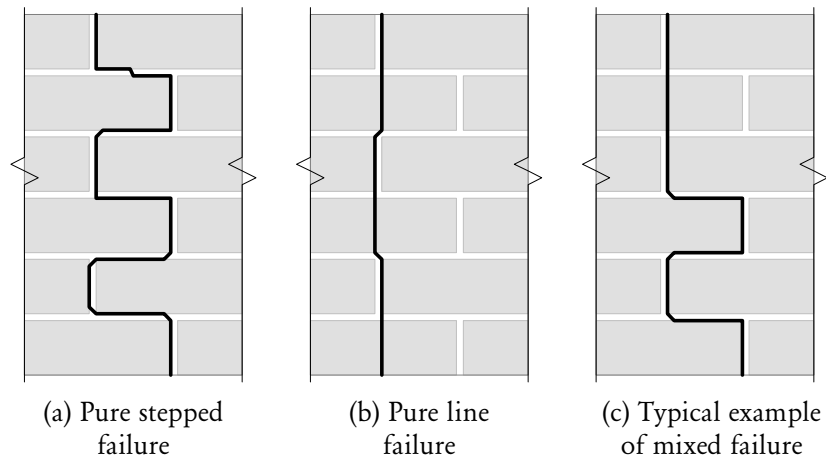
Different possible failure modes in horizontal bending: (a) Pure stepped failure; (b) Pure line failure; (c) Typical example of mixed failure.
